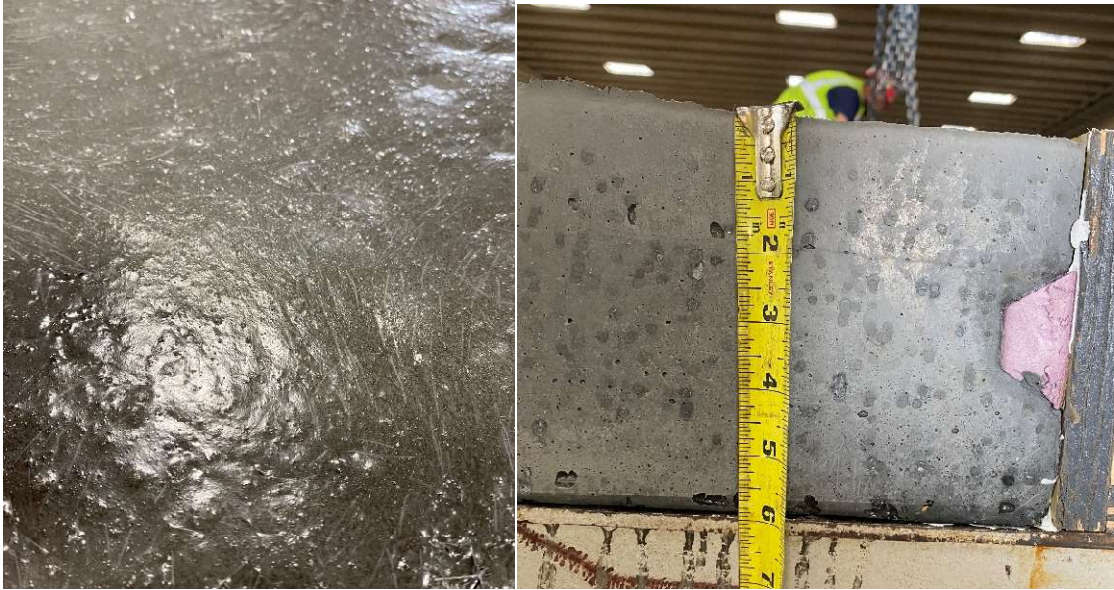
DIB with solid slab top surface (left) and flange thickness (right)
